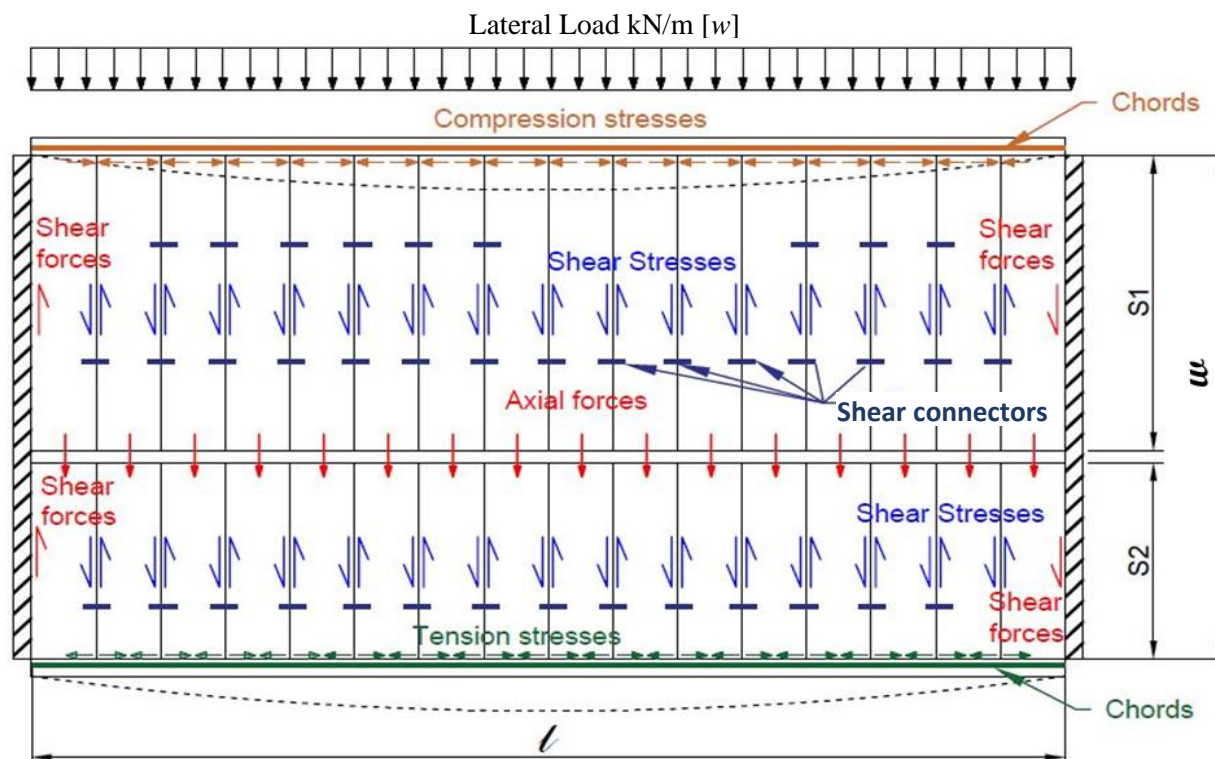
Scheme of un-topped HCS diaphragm floor – Deep horizontal beam analogy.
